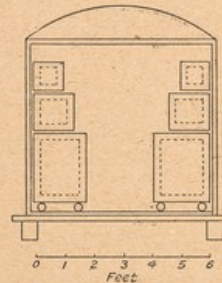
Cross Section. Showing arrangement of cupboards and superimposed shelves. The gangway permits of ready access to, and removal of any piece of furniture separately without disturbing the rest.
